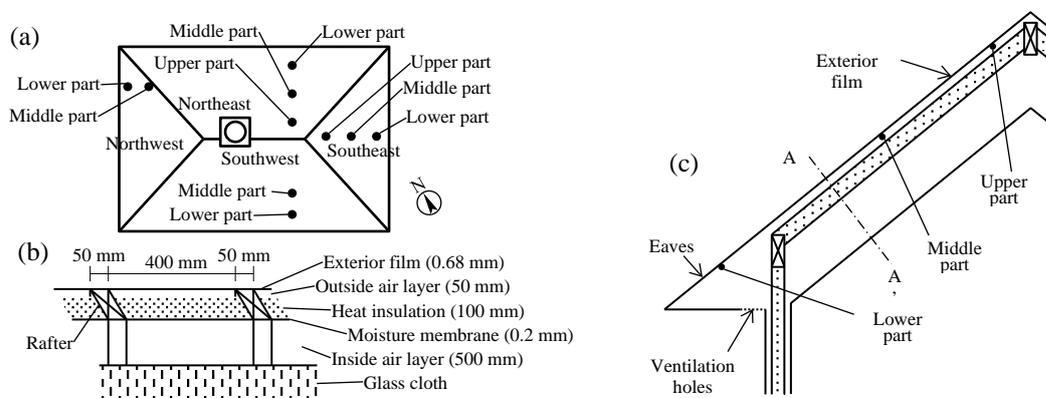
Measured house: (a) roof plan, (b) A–A' section of roof in (c), and (c) vertical section of the roof.
